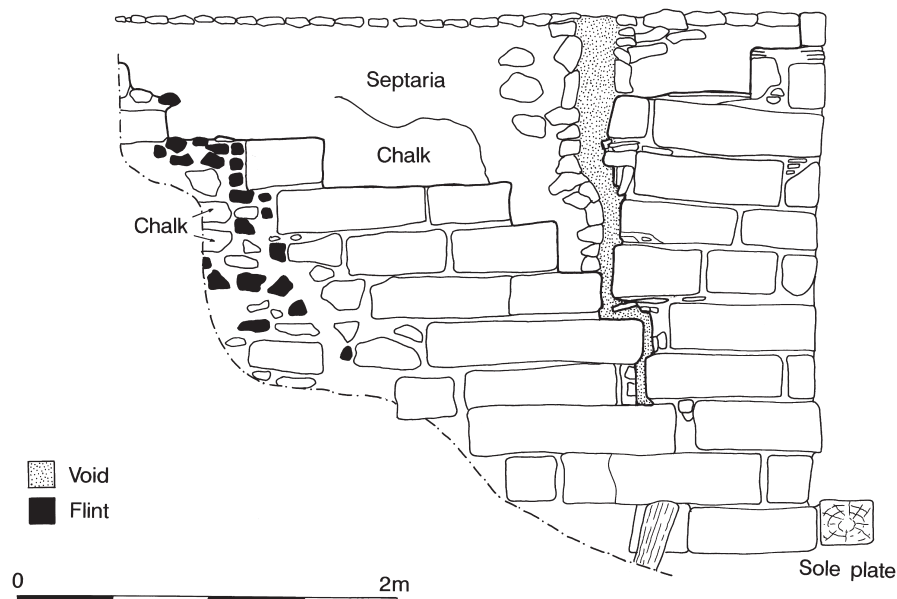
West side of north bridge abutment, showing large crack caused by slumping into the moat
